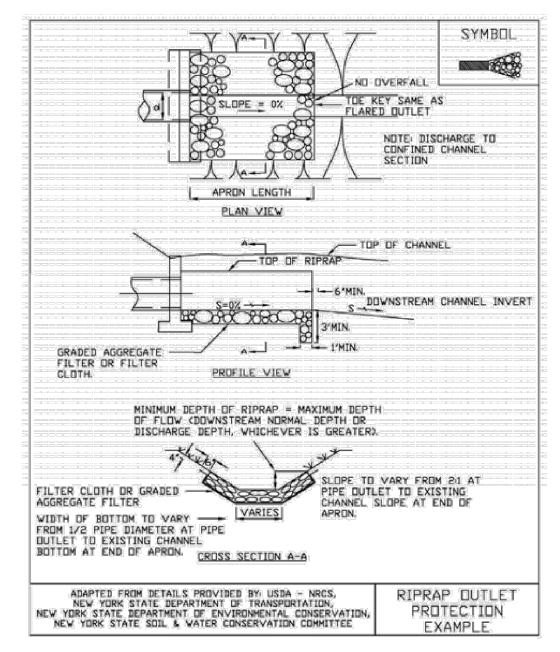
Riprap Outlet Protection Detail (1)
